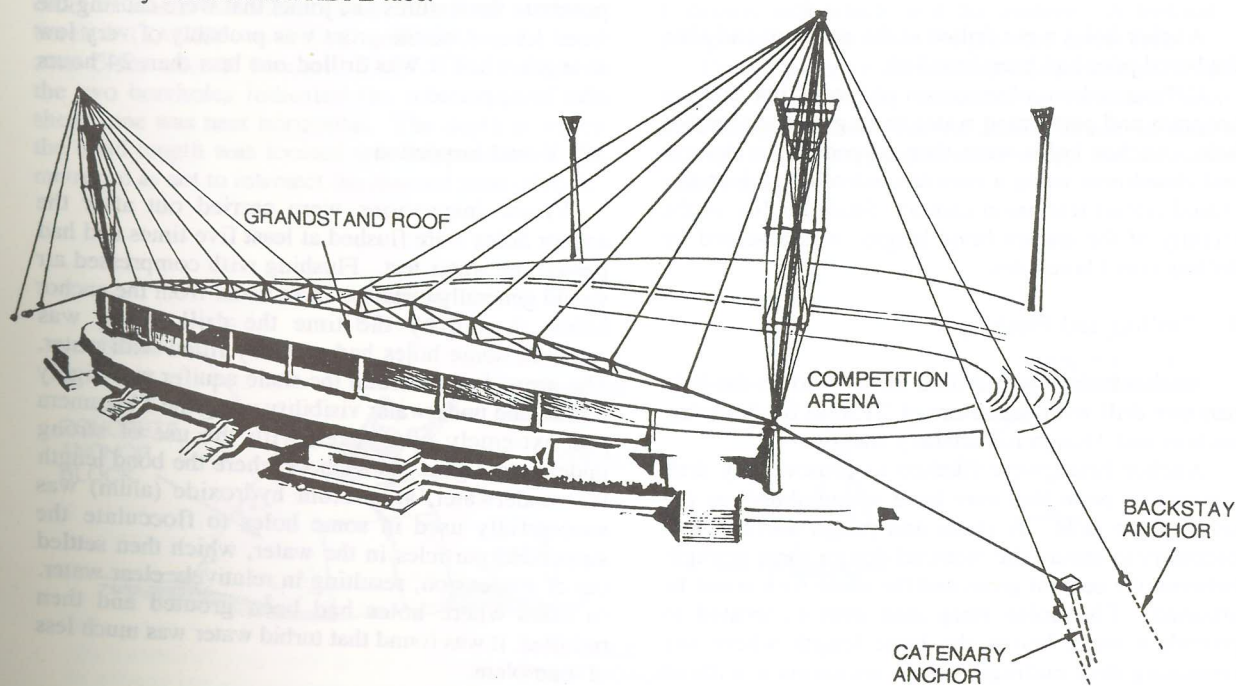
General arrangement of the grandstand roof, superstructure, and rock anchors.
